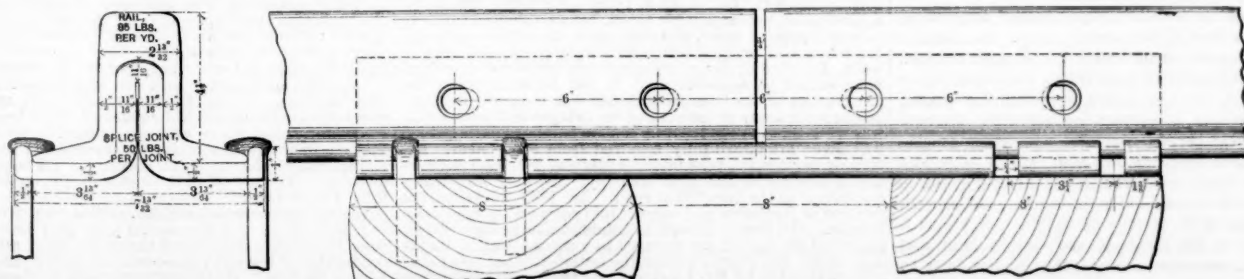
Suggested Rail-Section and Splice (Brunel Bridge Type).
